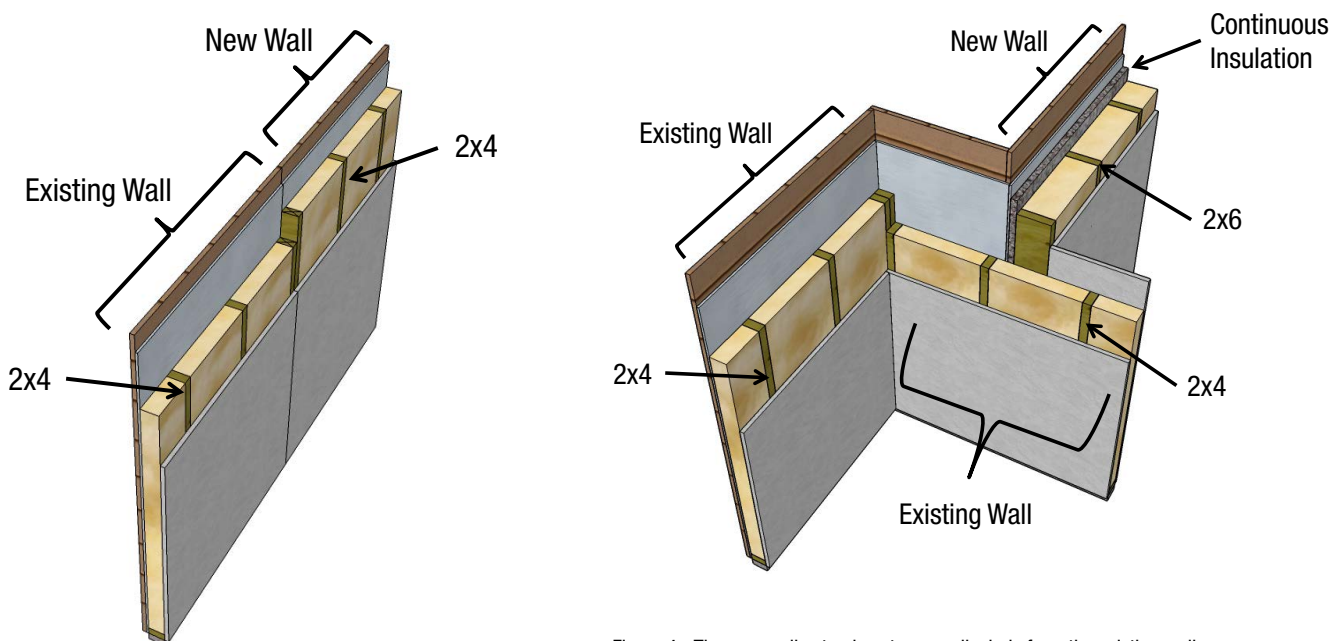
The new wall extends out perpendicularly from the existing wall.
